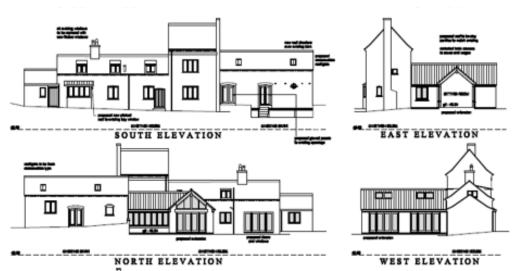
Approved Elevations under 14/01991/FUL (barn elevations amended by 17/01330/FUL & 20/00536/FUL)
